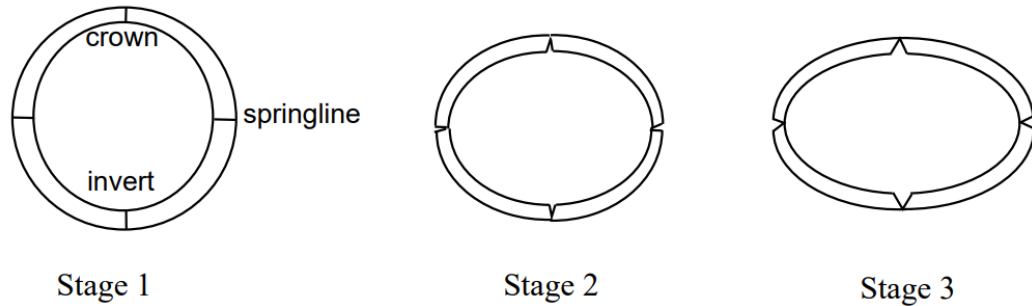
Collapse process in concrete sewer pipes (Davies et al. 2001)
